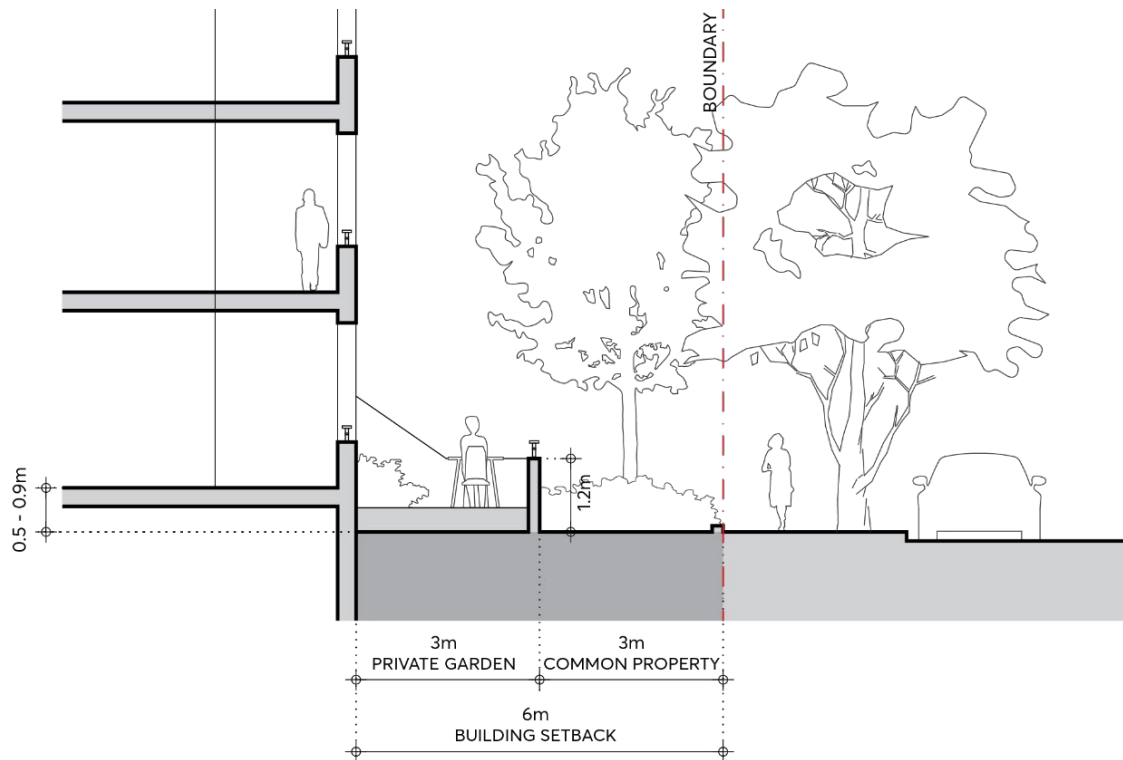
Front setback to residential flat buildings
